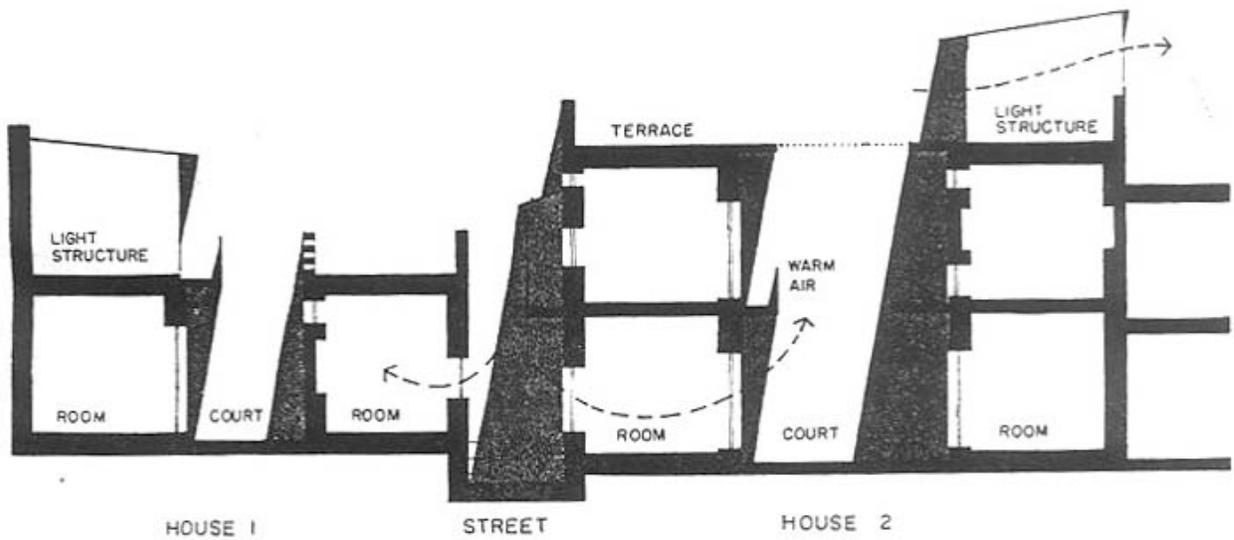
Typical section through Shahjahanabad houses. The main building is massive while a light-weight structure is built above it
